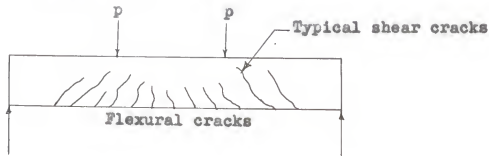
SHEAR FAILURE IN PRESTRESSED BEAMS.
